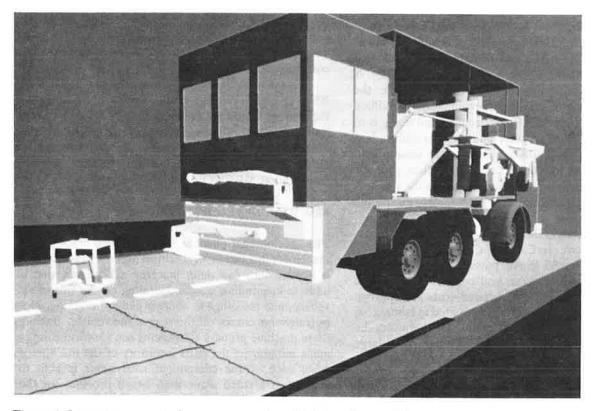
Computer generated pavement crack and joint sealing machine.
